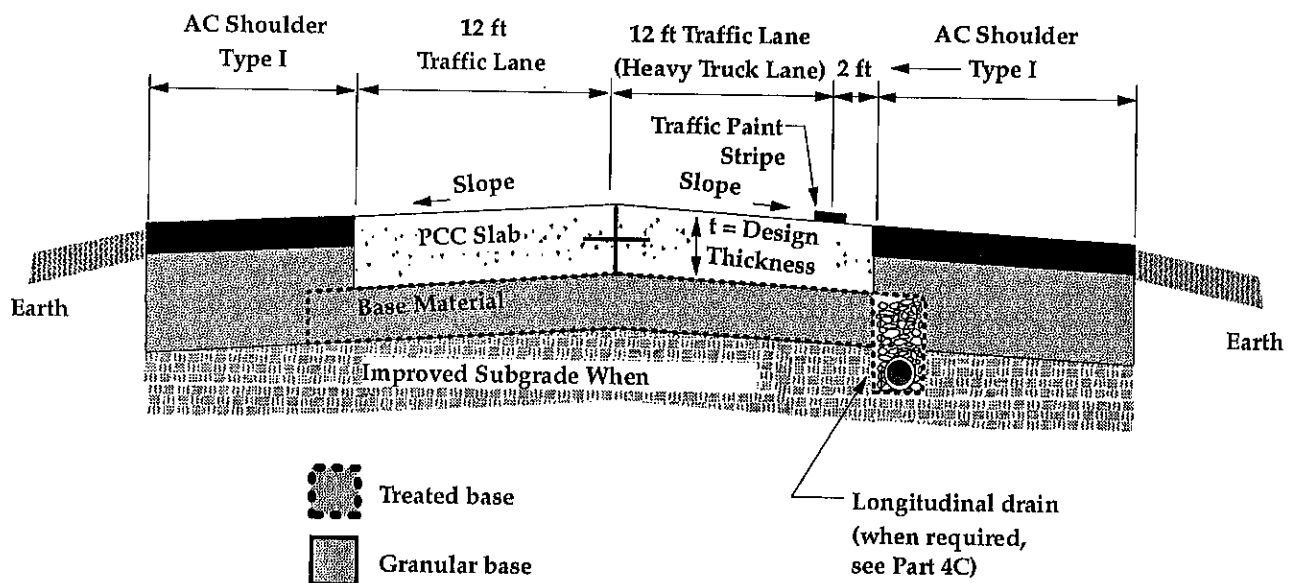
Cross section for a rural highway, two or more lanes in one direction, widened slab, HMAC shoulders, and uniform slab thickness pavement (Sections 3A and 3B).
